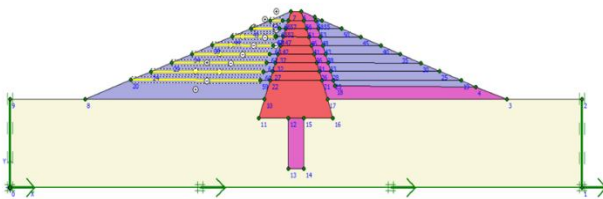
Modeling of Alaviyan Dam under static stability despite geotextiles
